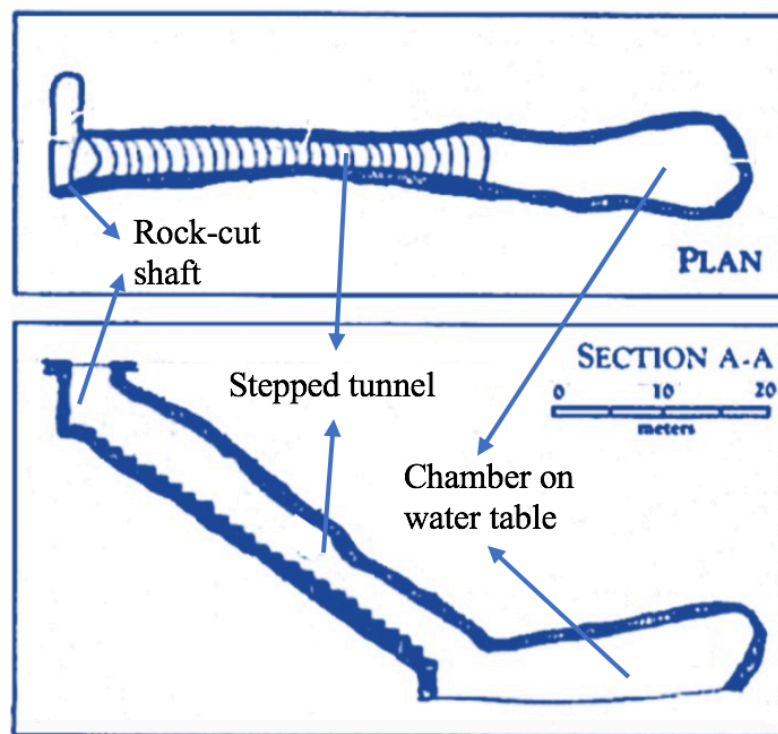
Plan and section of Gezer's underground water system (adapted from Cole 1980)
